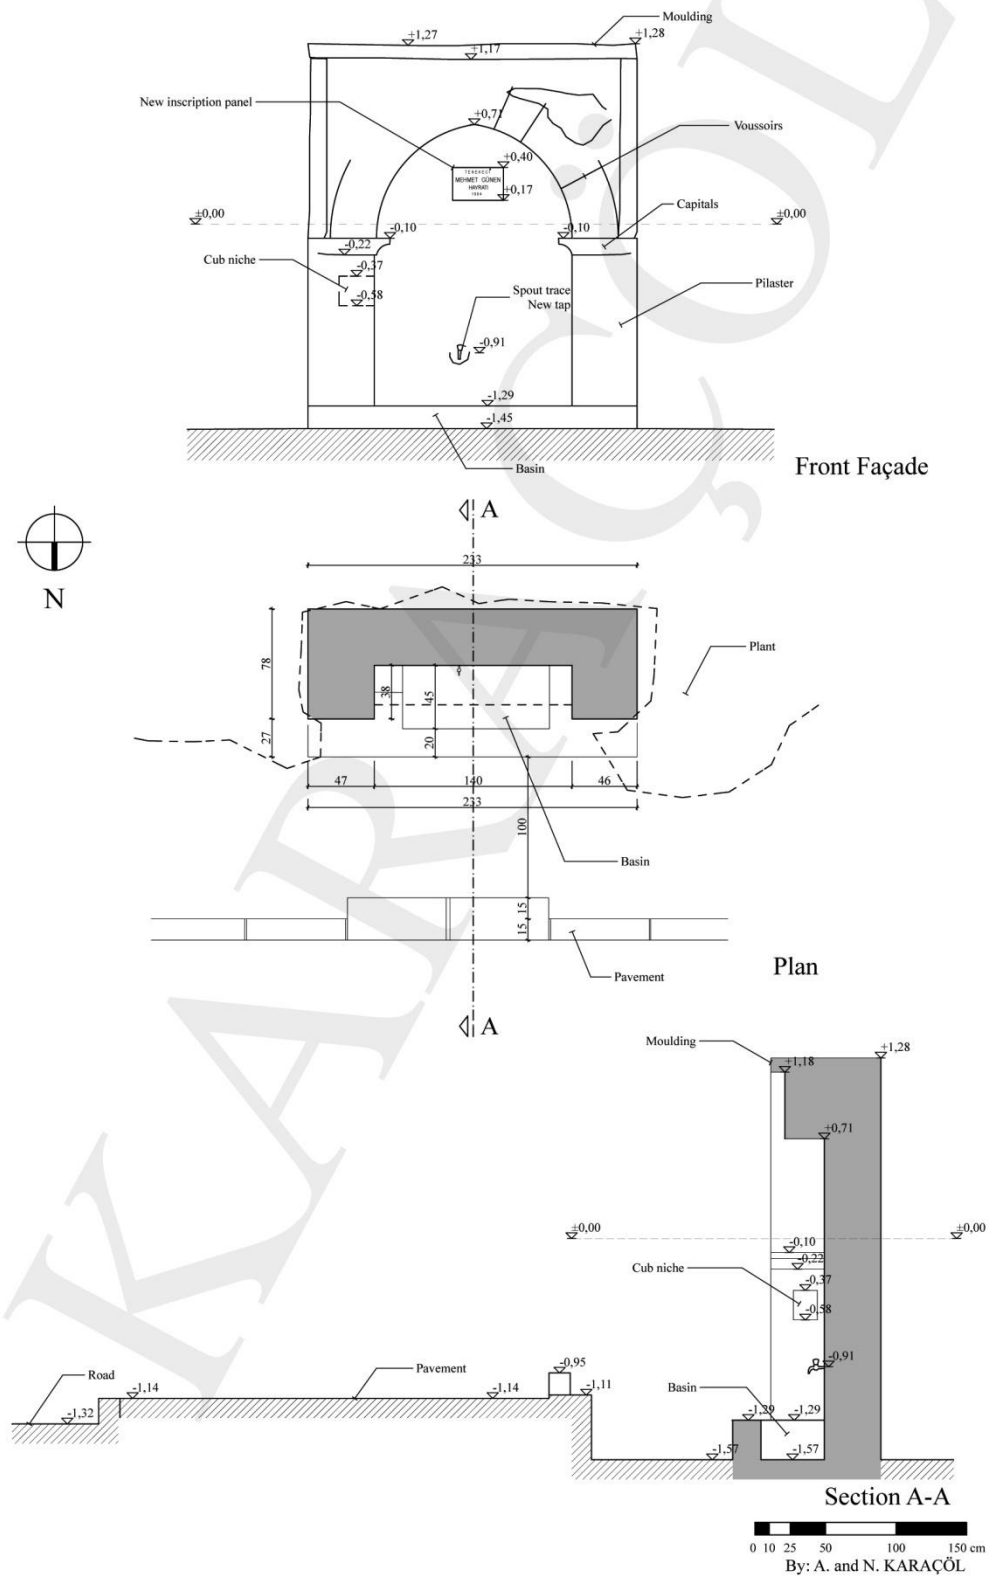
Tenekeci Fountain front façade, plan and section drawings
